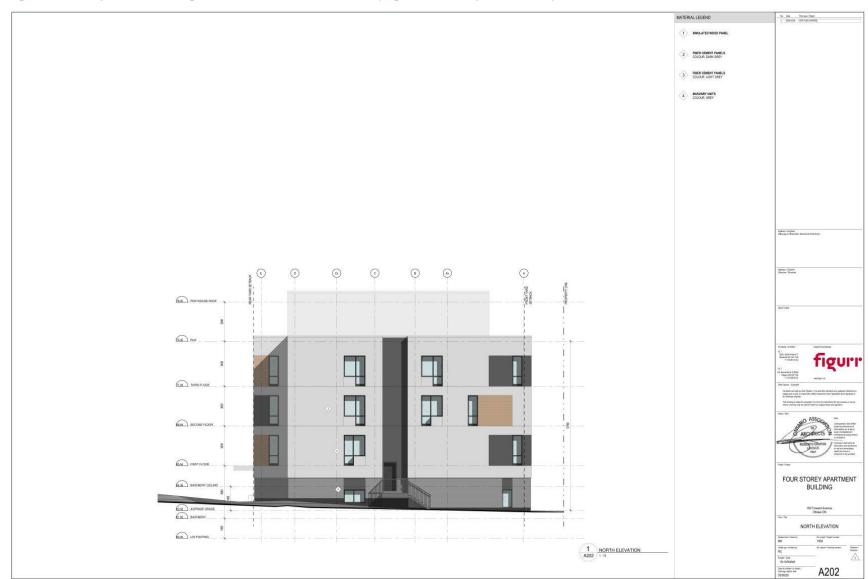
Proposed Building Elevation – North Elevation (Figurr, dated April 28, 2020)
